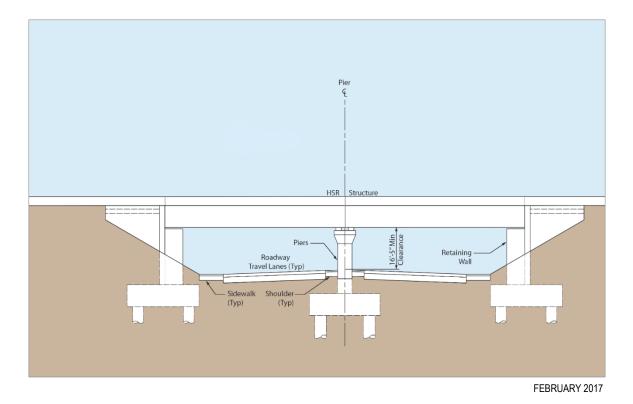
Typical Cross Section of Roadway Grade-Separated Beneath HSR Guideway
